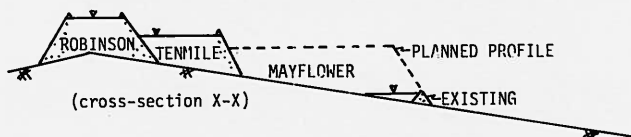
Simplified cross-section of Robinson, Tenmile and Mayflower tailing impoundments.
